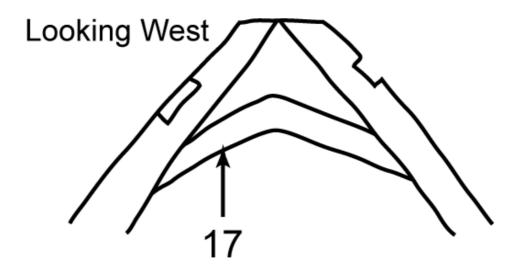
Sketch of truss 6, viewed looking west, showing sample location
